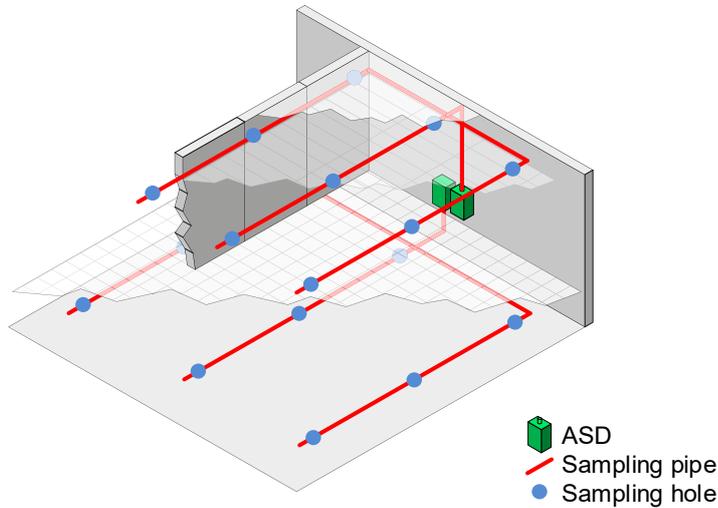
Fire detection placement (raised floor or ceiling plenum)
